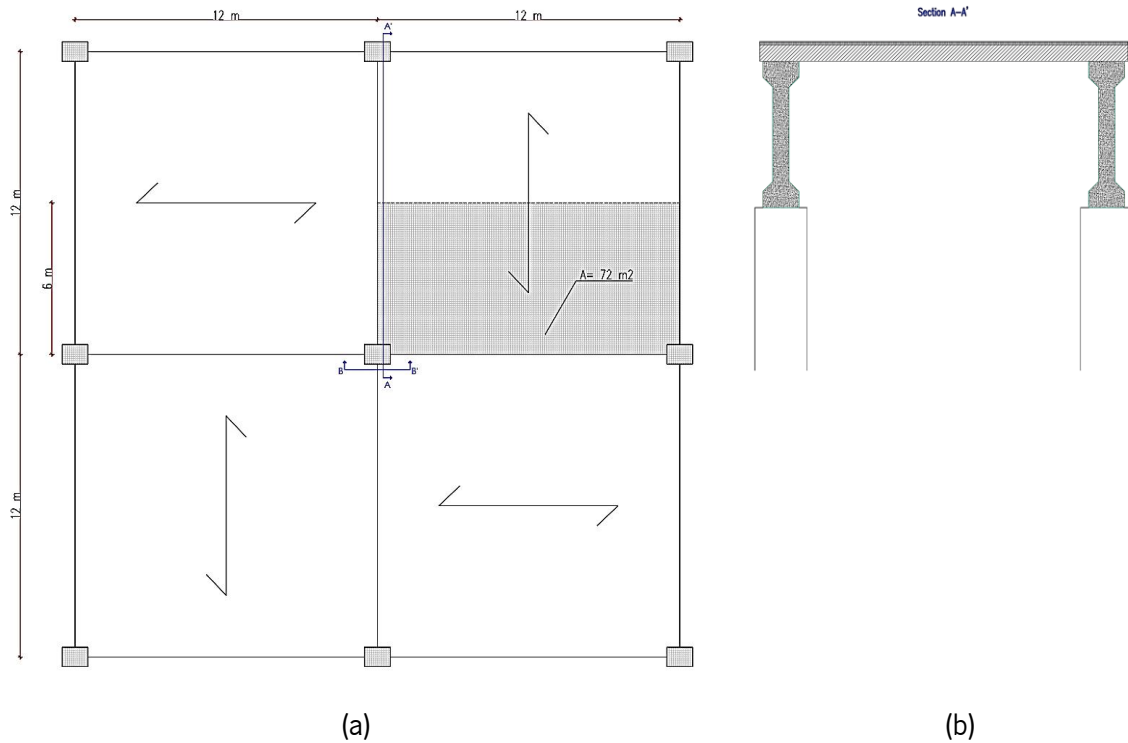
Hypothetical case study: (a) Structural application of the beam, (b) Section A-A'.
